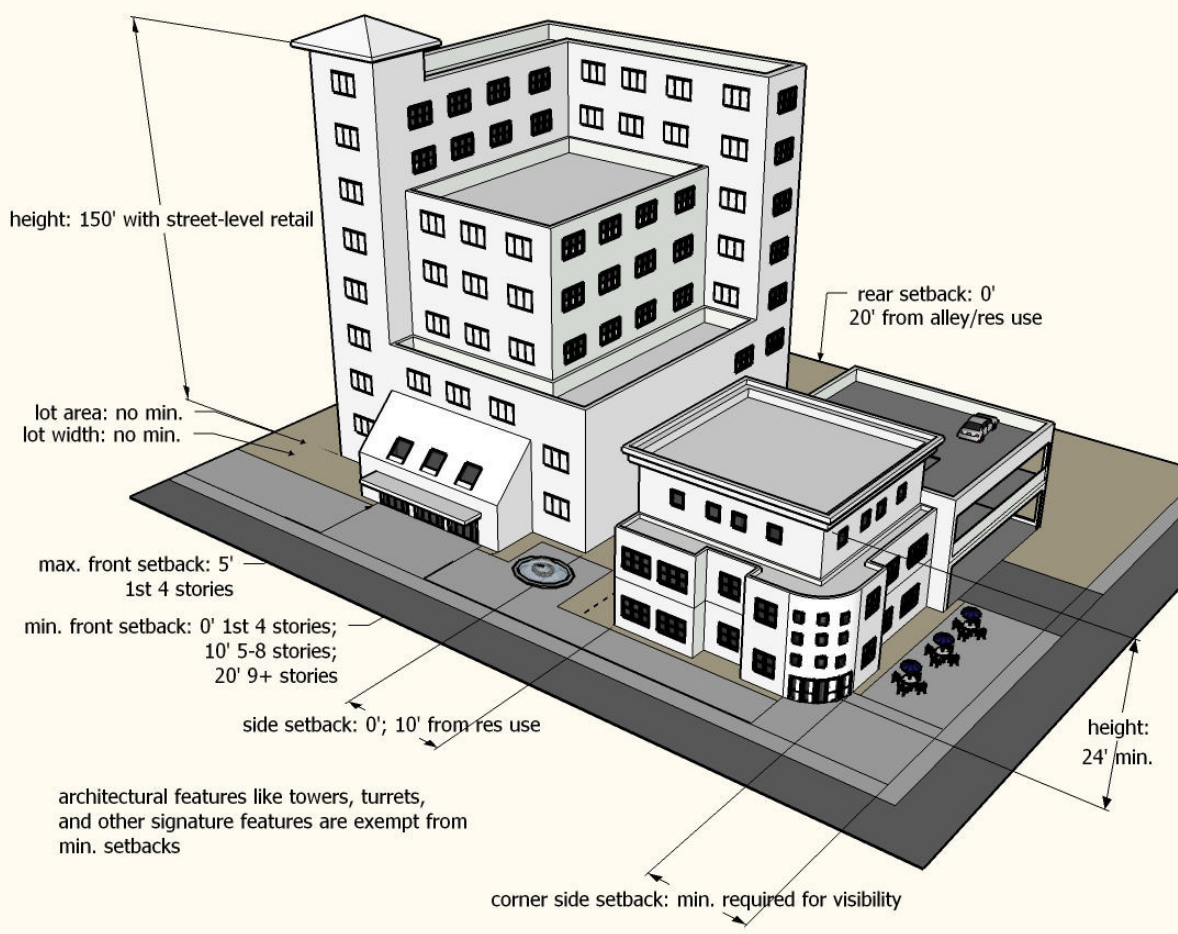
E.7.c: DT Typical Building/Lot Configuration
